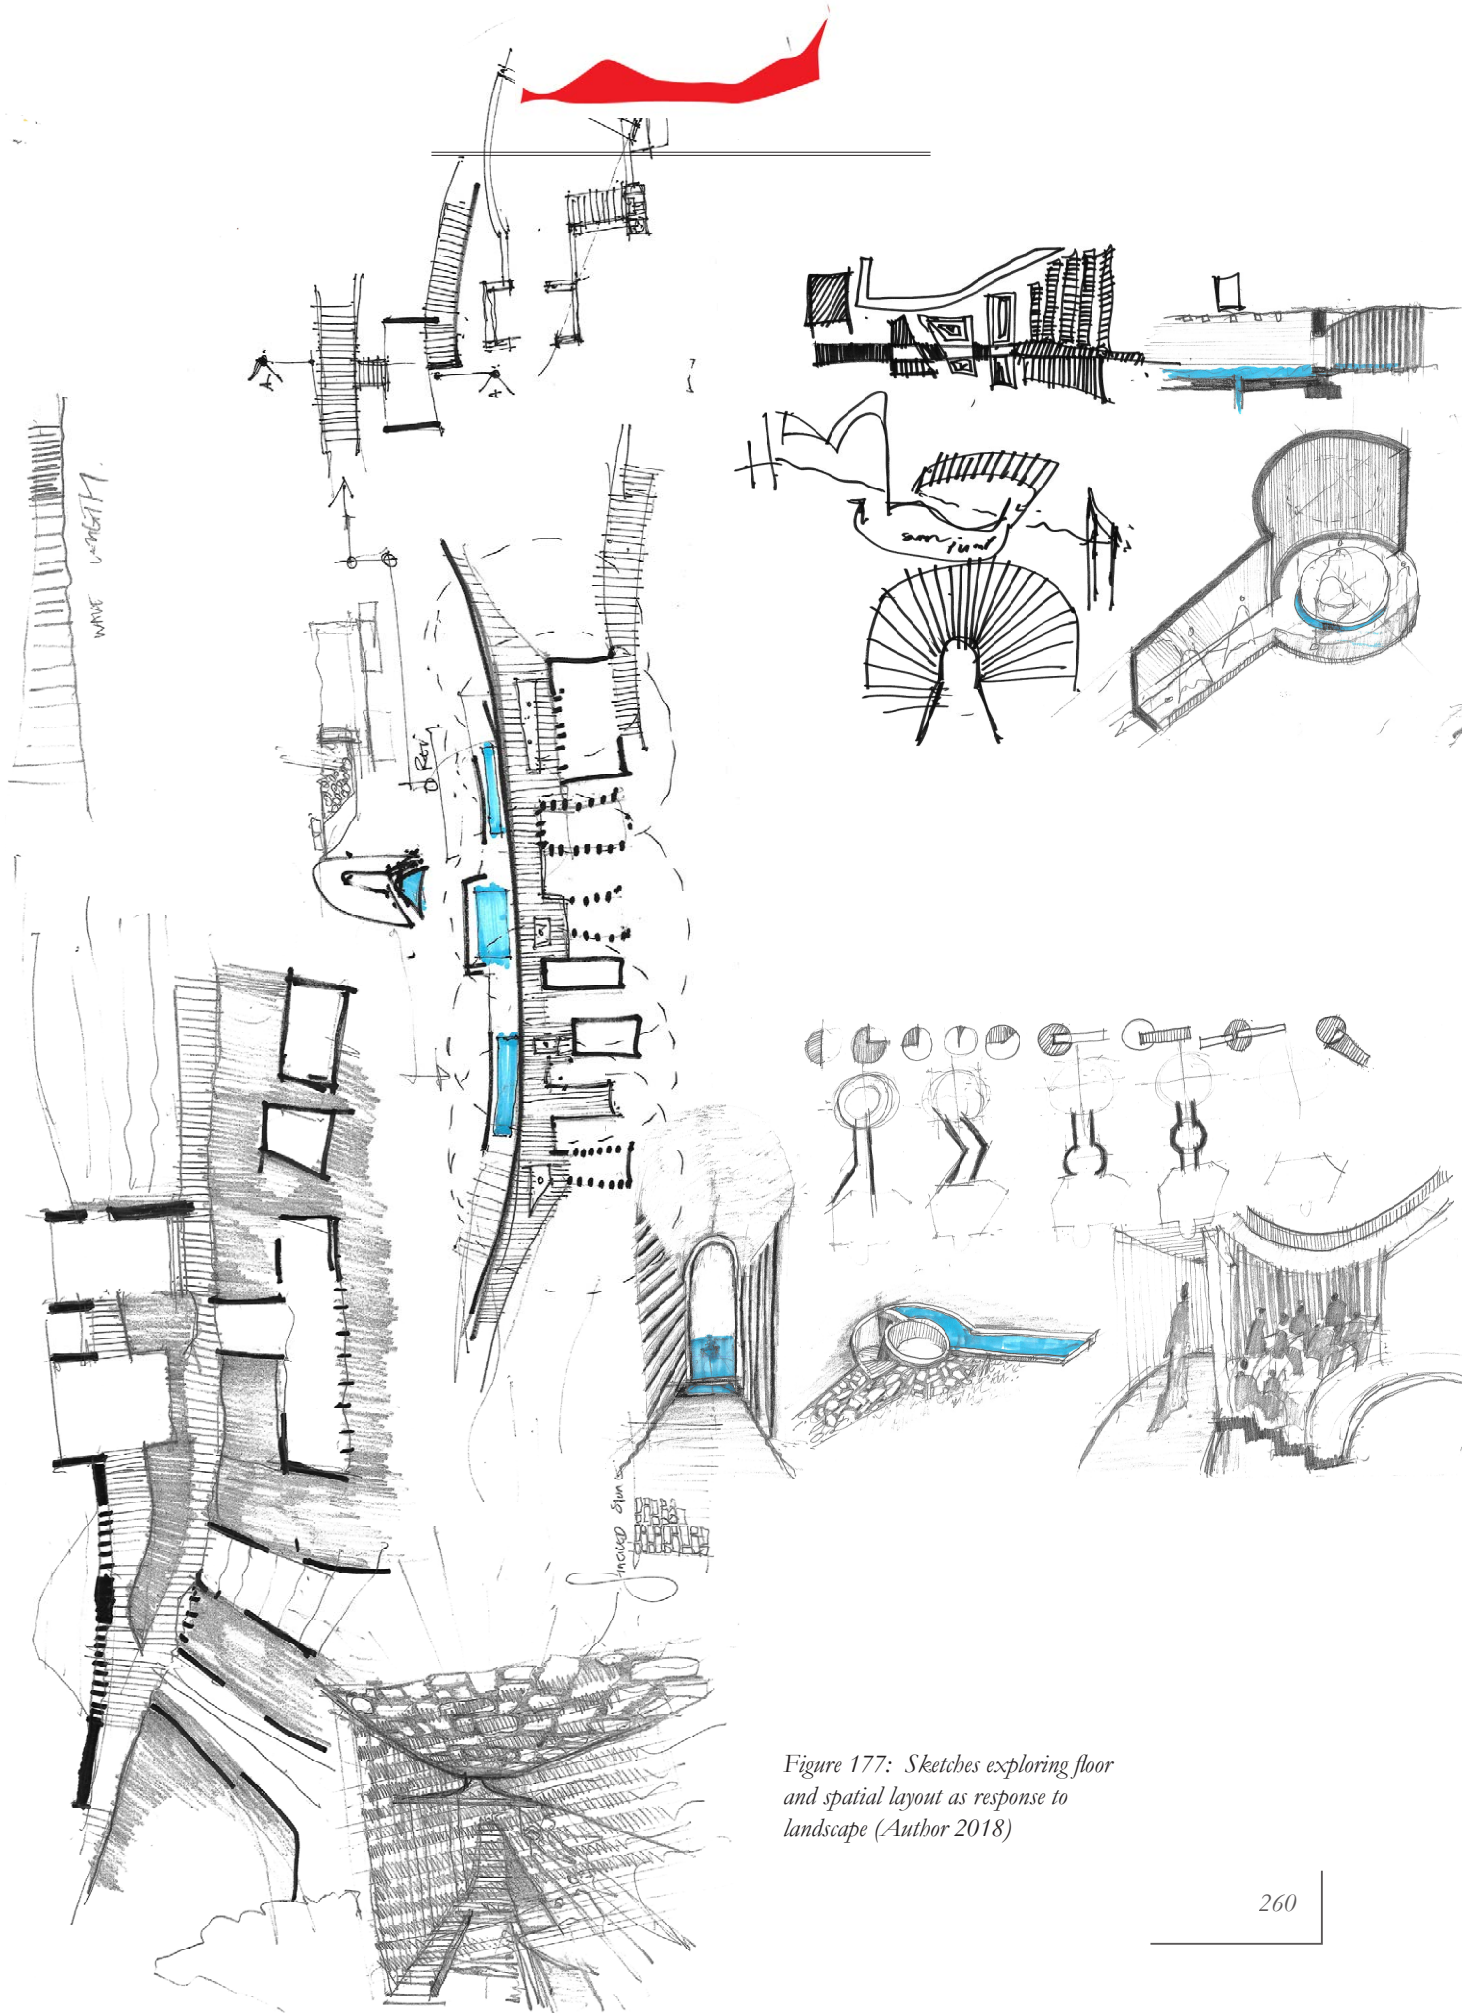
Sketches exploring floor and spatial layout as response to landscape (Author 2018)
